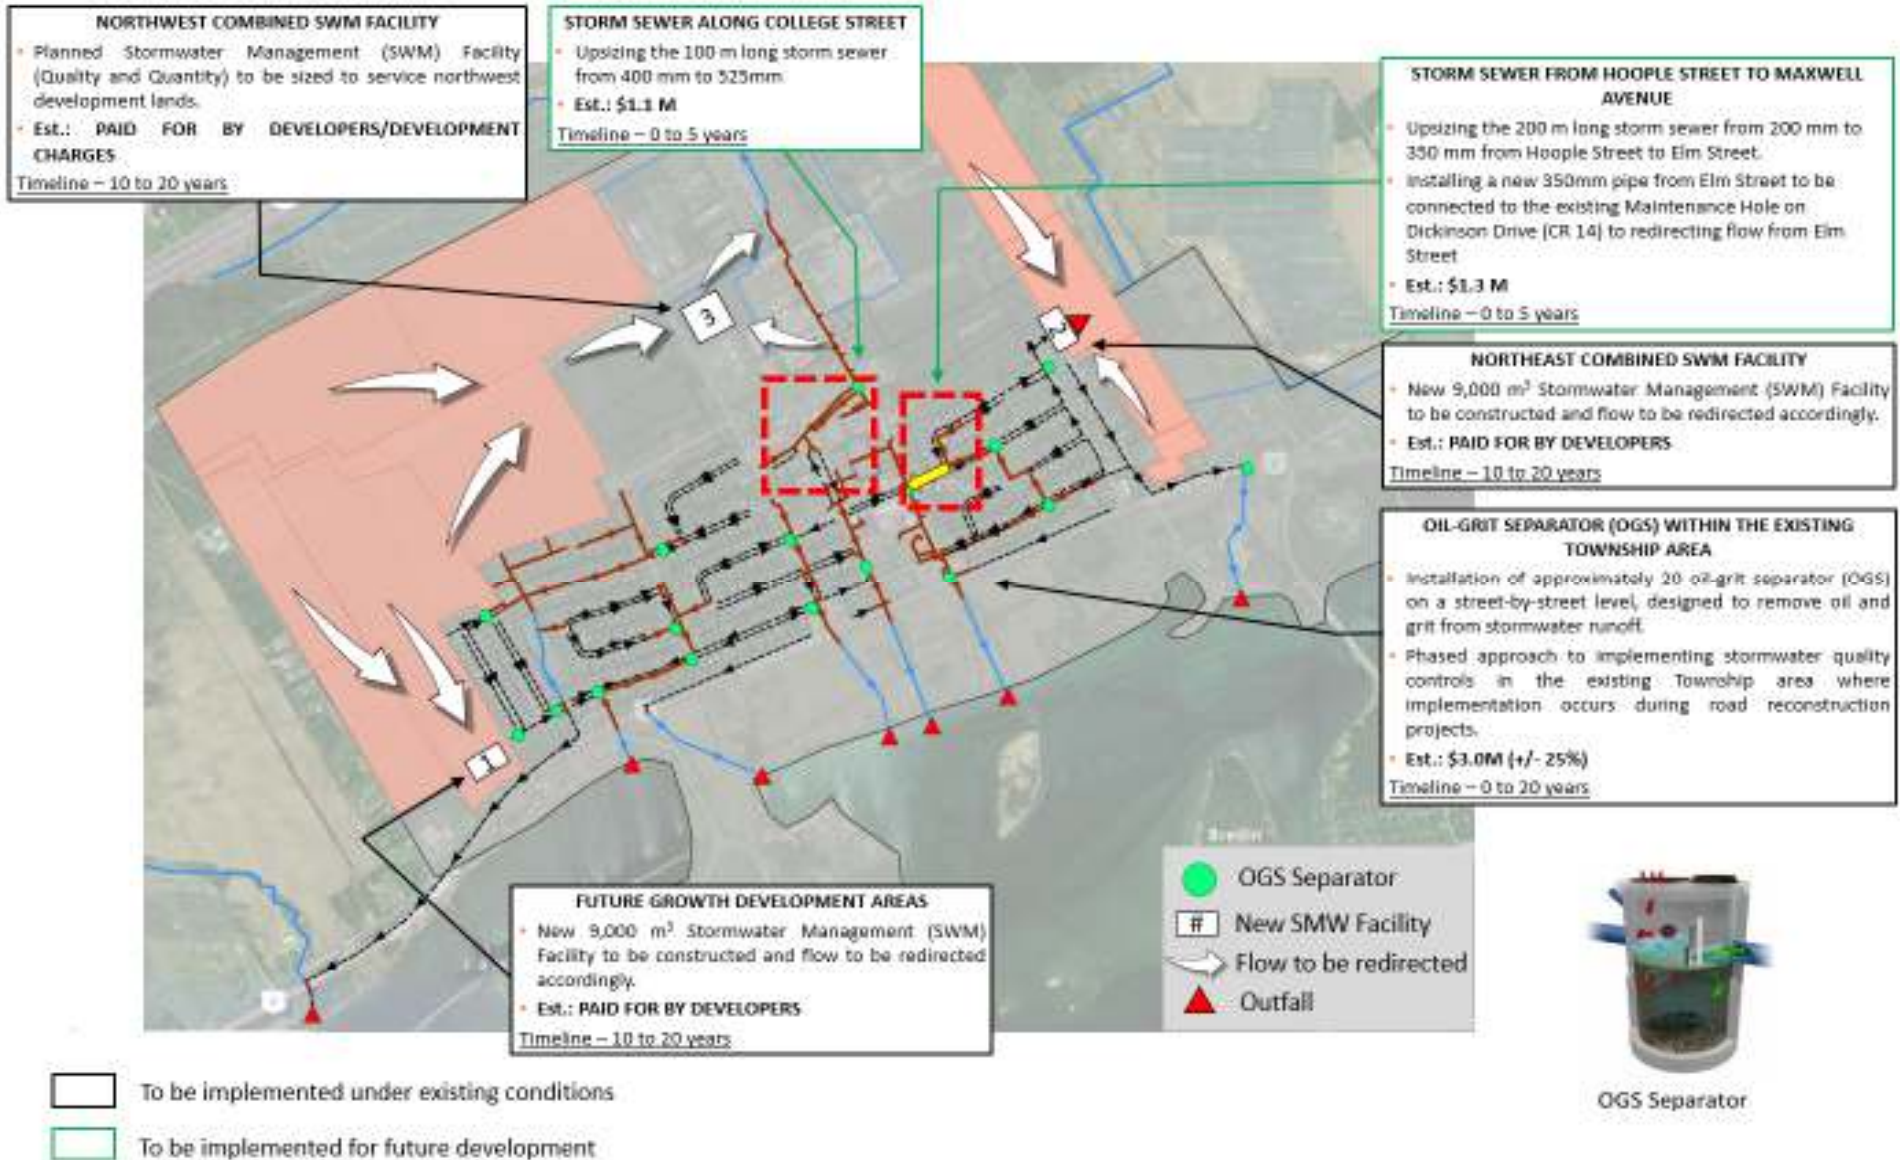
Preferred Alternative - Ingleside Stormwater System
